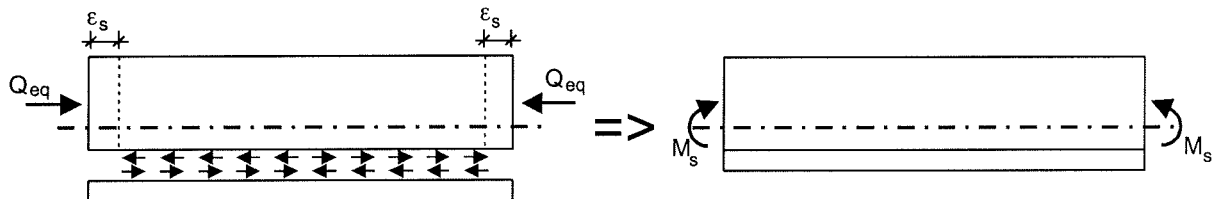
Loading of the filigree slab due to shrinkage of the concrete topping
